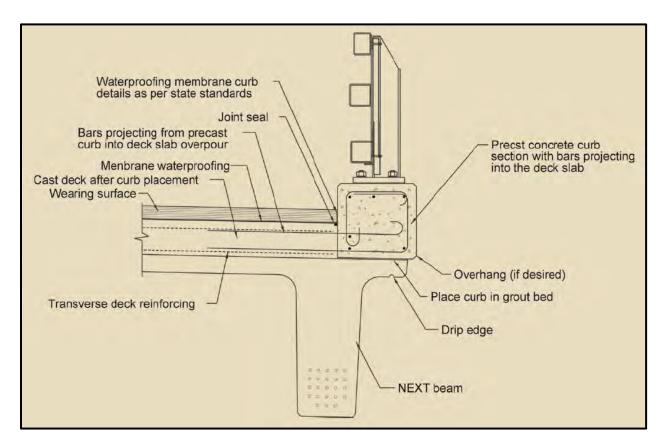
Detail of NEXT Concrete Railing Attachment
